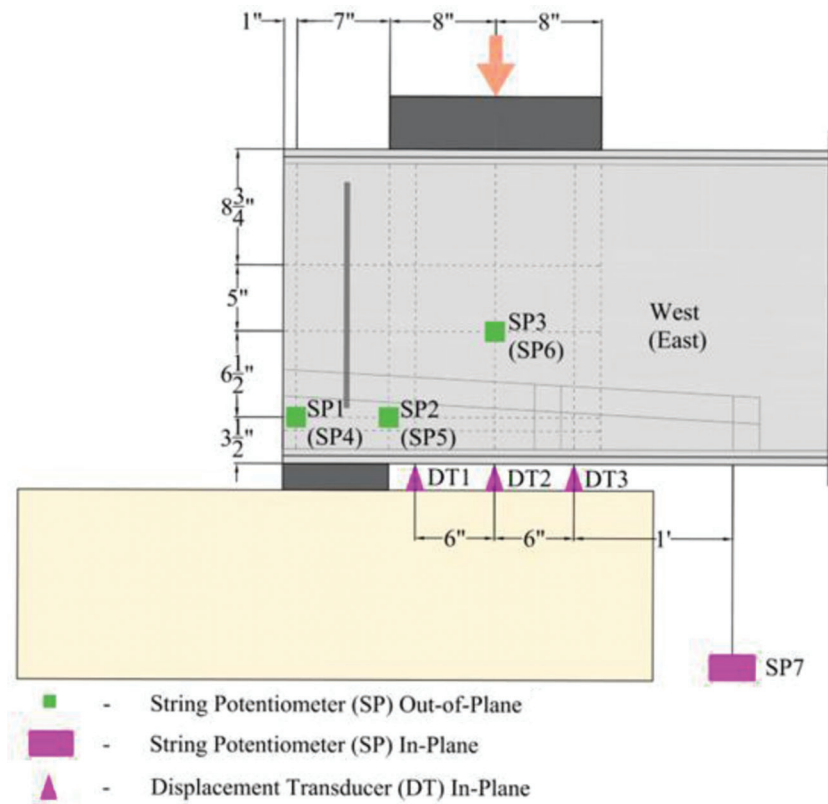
Displacement sensor layout (side elevation): Specimens 3, 6, and 7.
